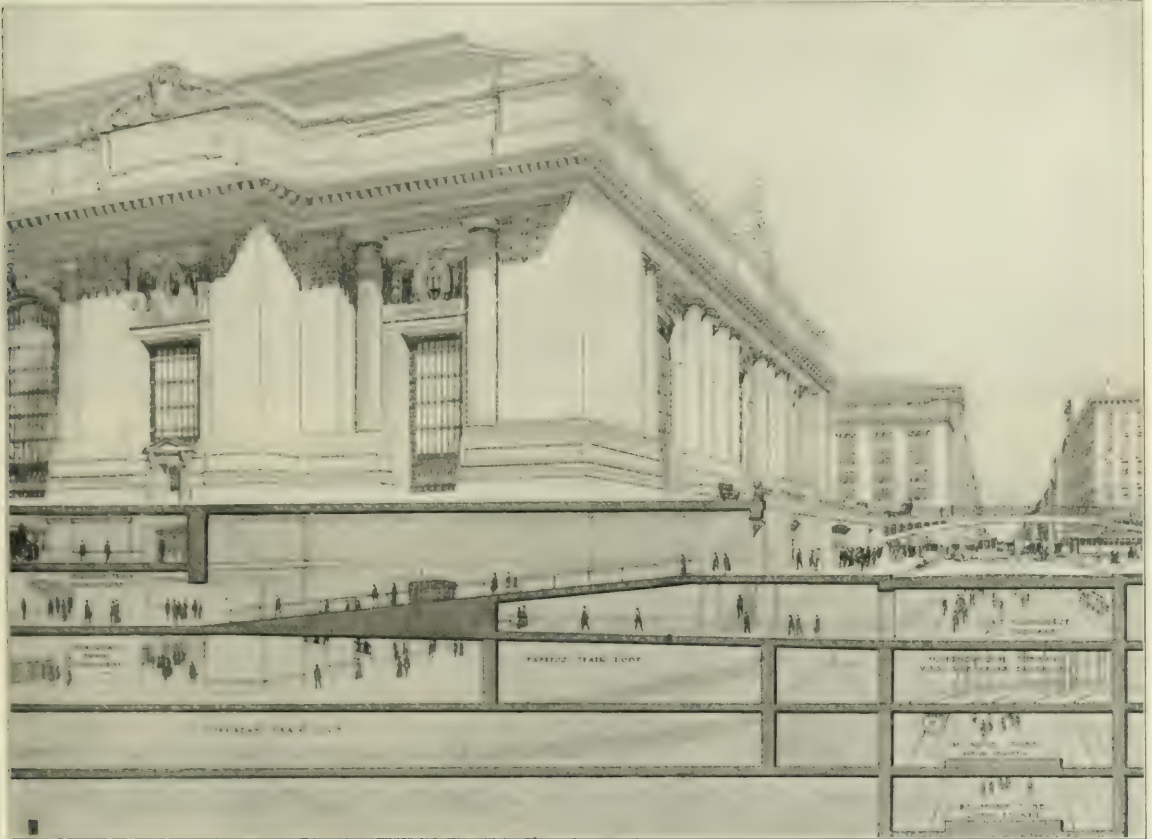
Grand Central Terminal, New York City. Proposed Elevated, Surface and Underground Approaches.
